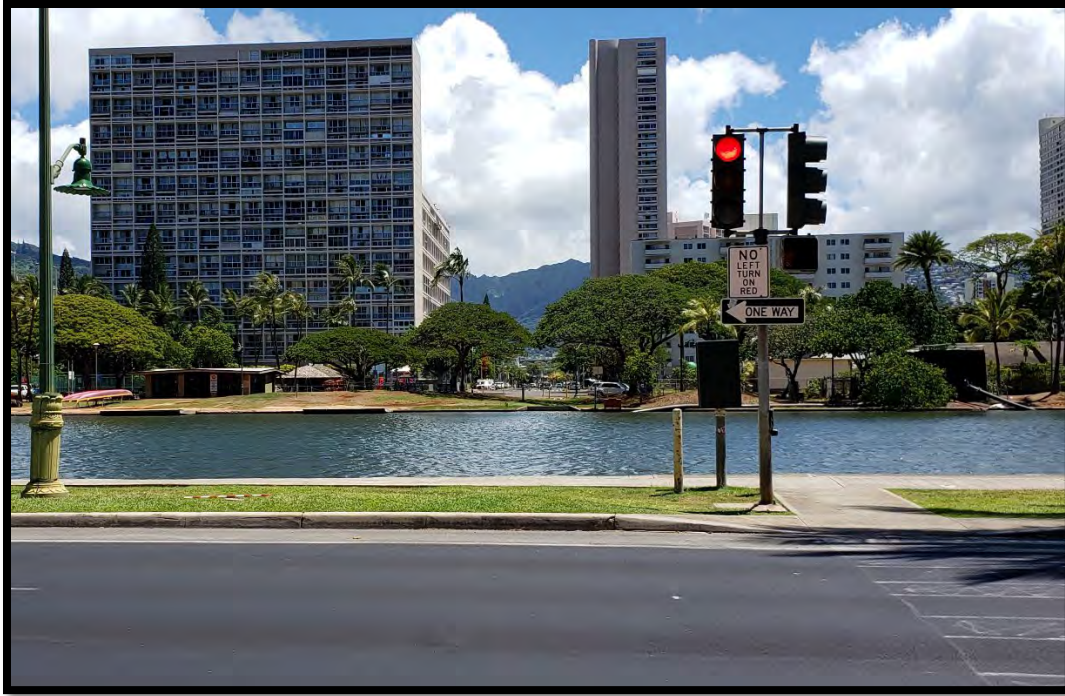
Overview photo of the proposed south landing for the proposed Ala Wai pedestrian bridge, at the intersection of Ala Wai Boulevard and Kālainmoku Street looking north toward University Avenue
